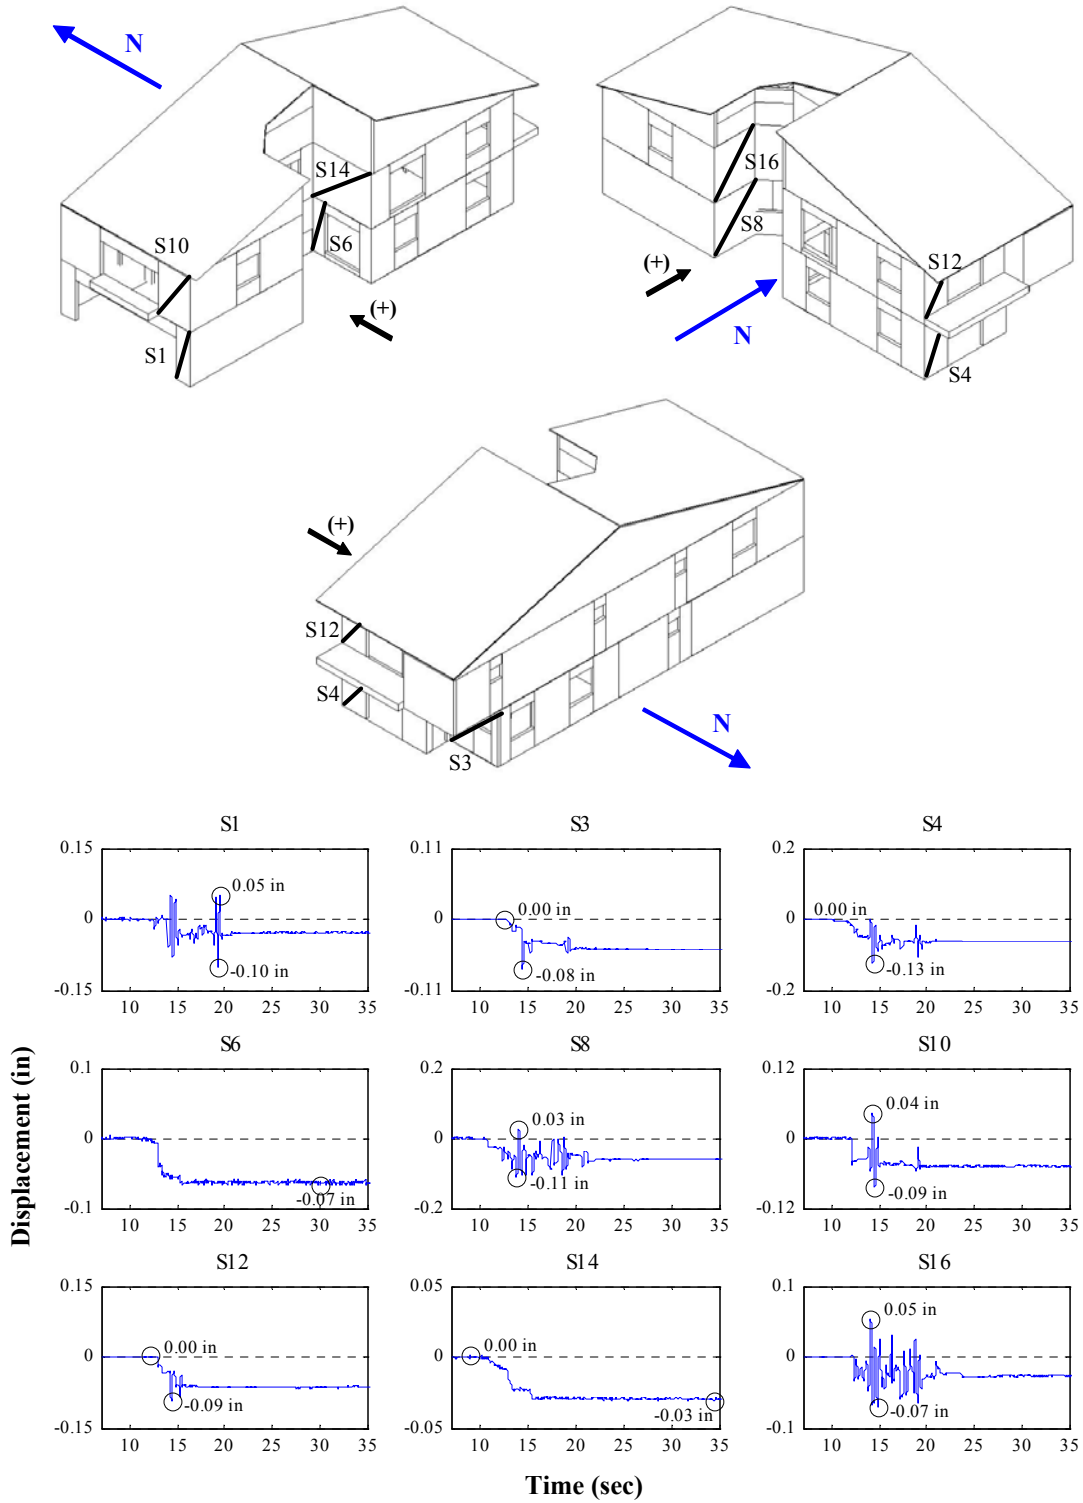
Wall deformations of north-south external walls for Test NWP2S26
